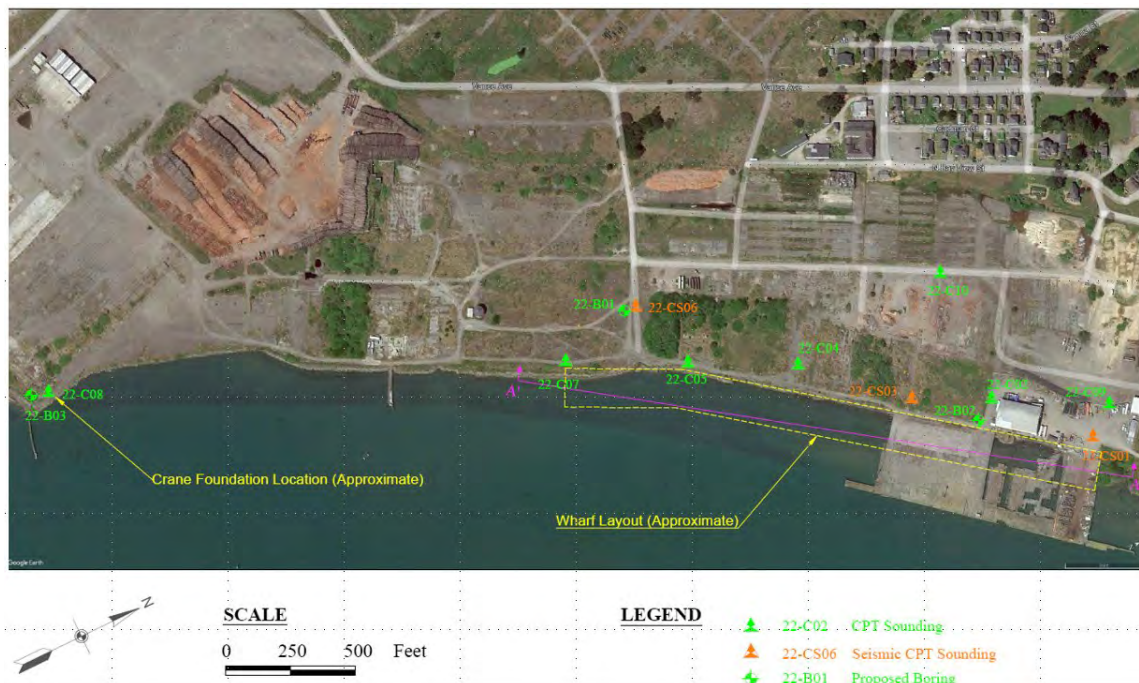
GEOTECHNICAL BORING LOCATION
